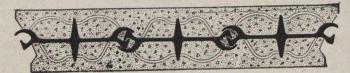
Method of Protecting the Centre Flange Type With Concrete.
